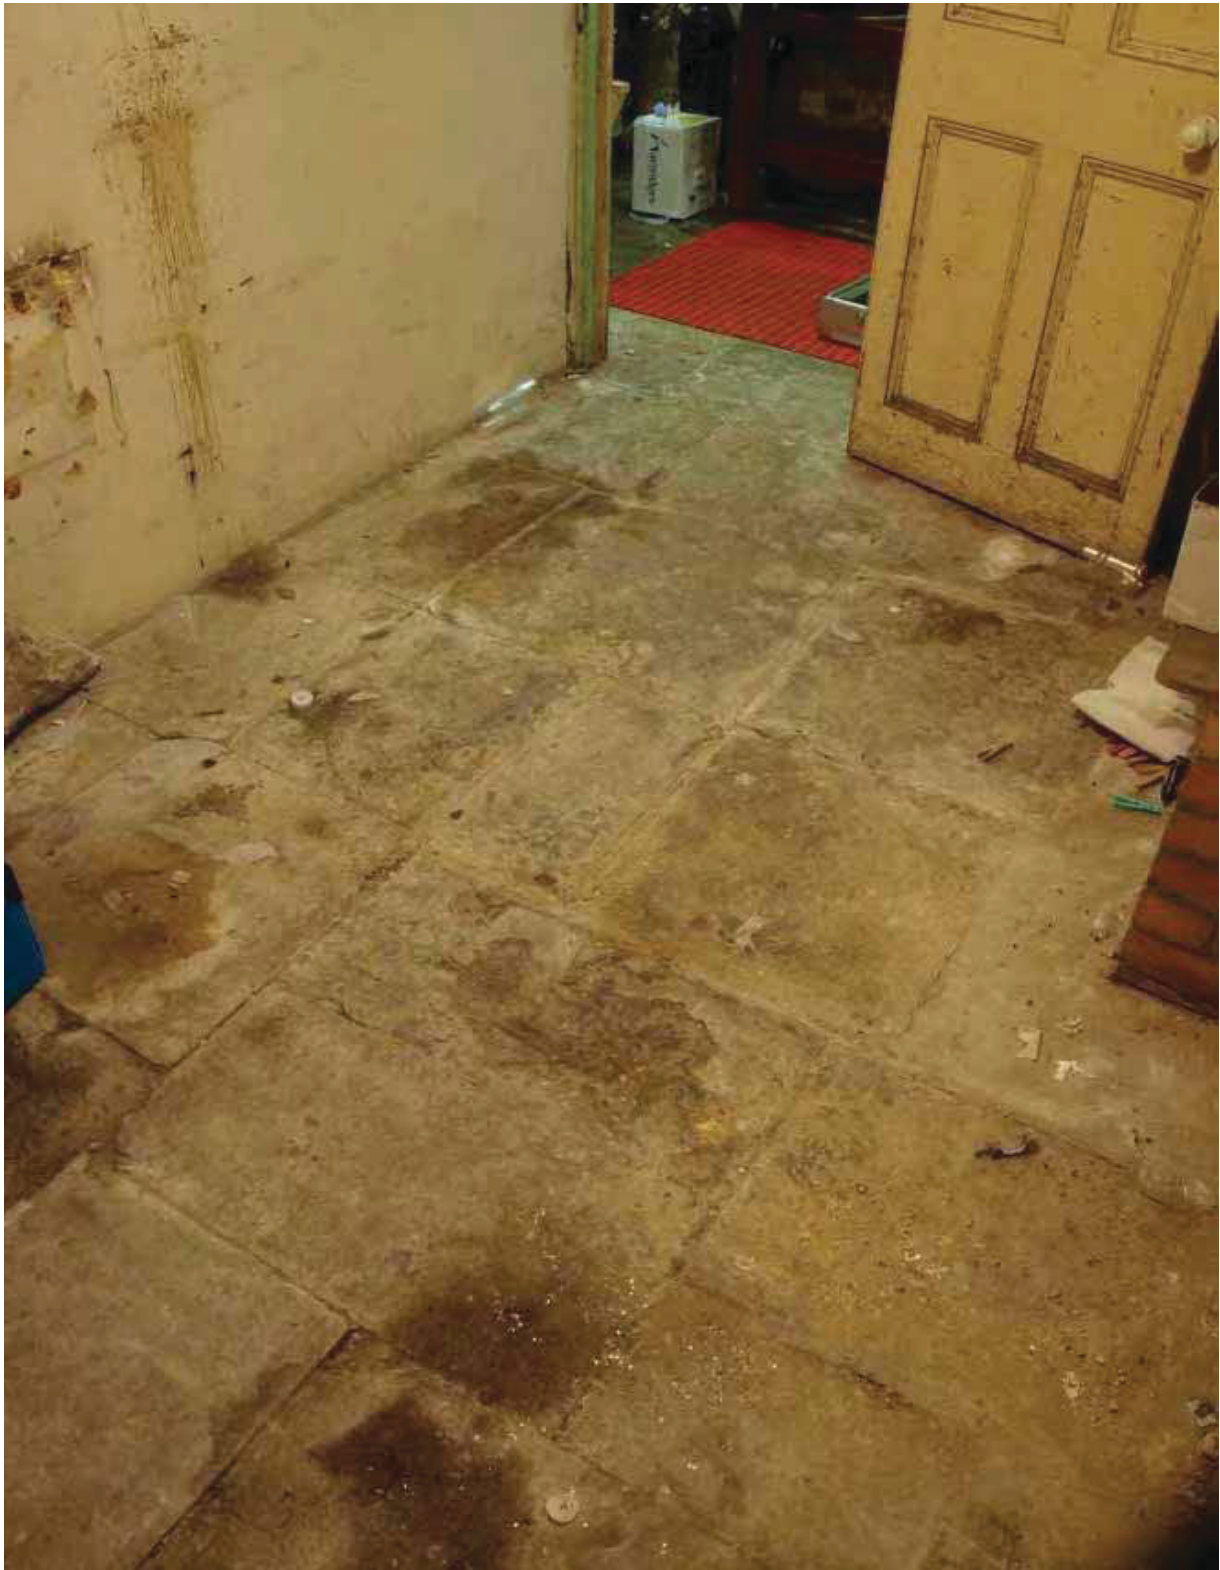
General Store G17 existing paving slabs to be removed and new non slip flooring for beer cellar to be installed
